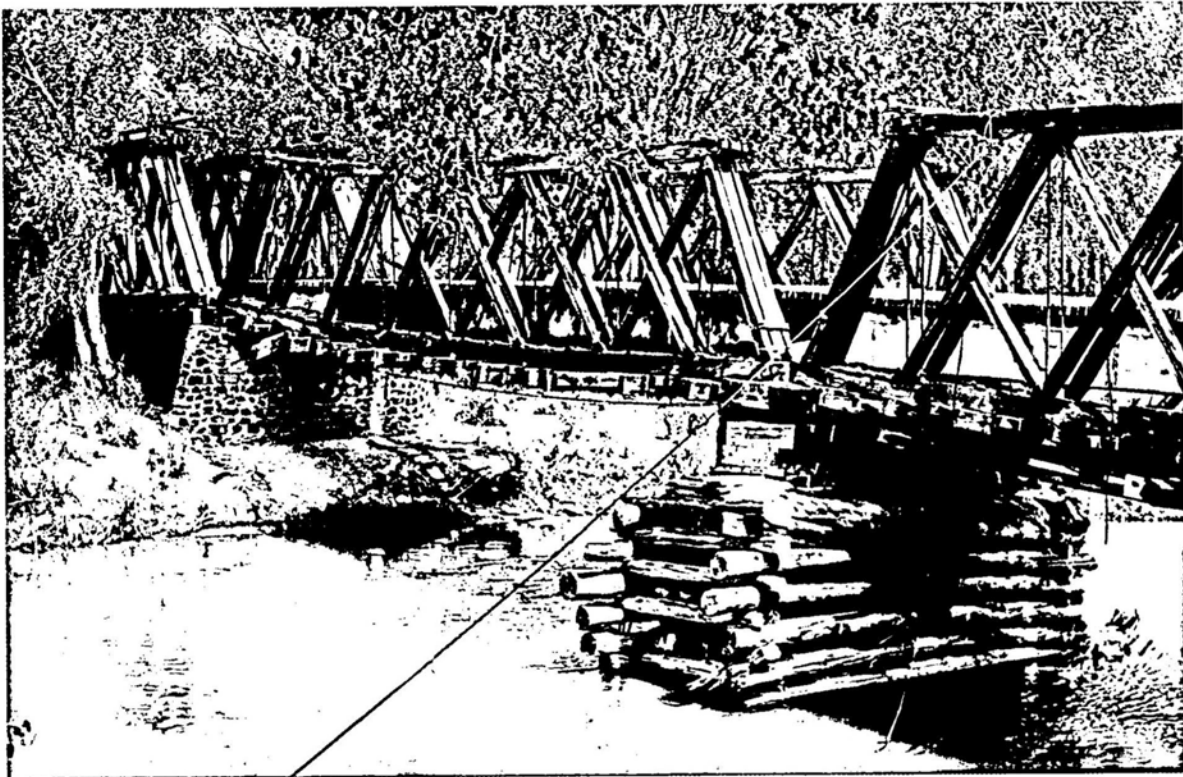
Rio Grande Bridge at Embudo (No. S-19)
